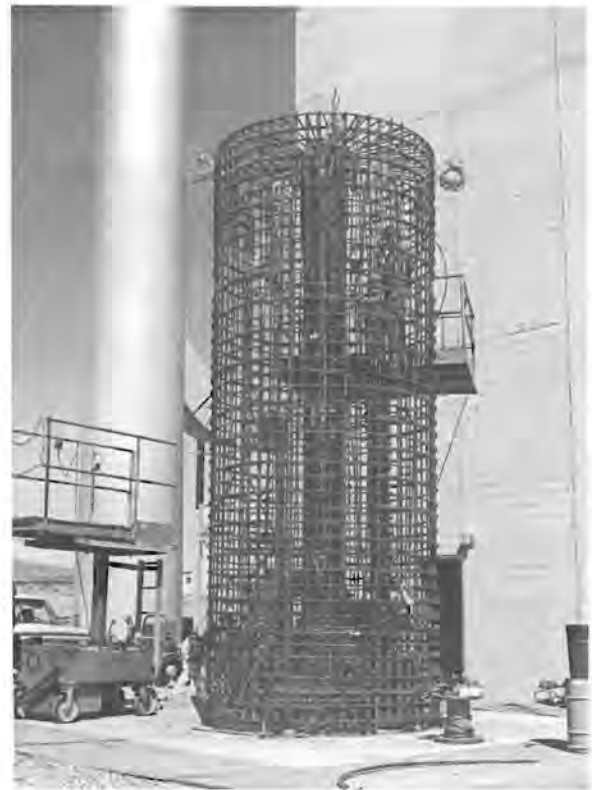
Concrete Silo Reinforcing Bar Assembly Completed
